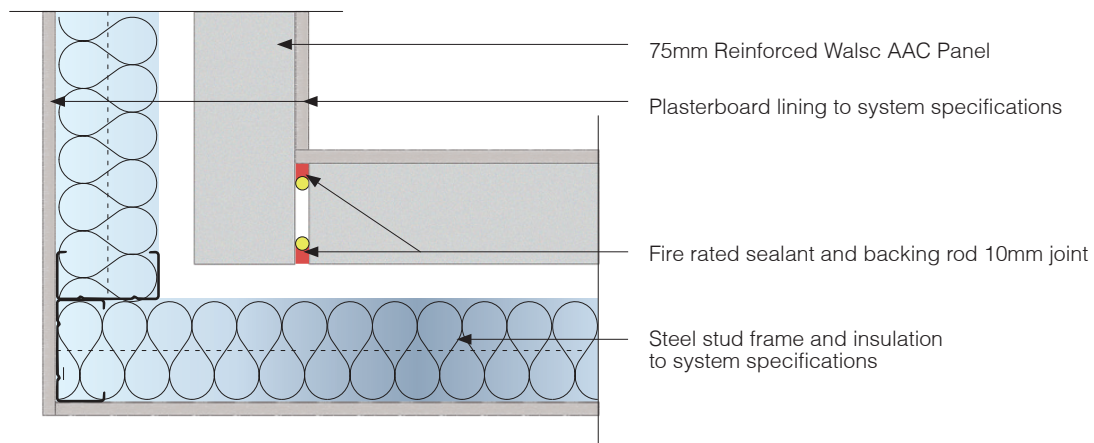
Internal Cavity Wall System Corner Control Joint Detail
